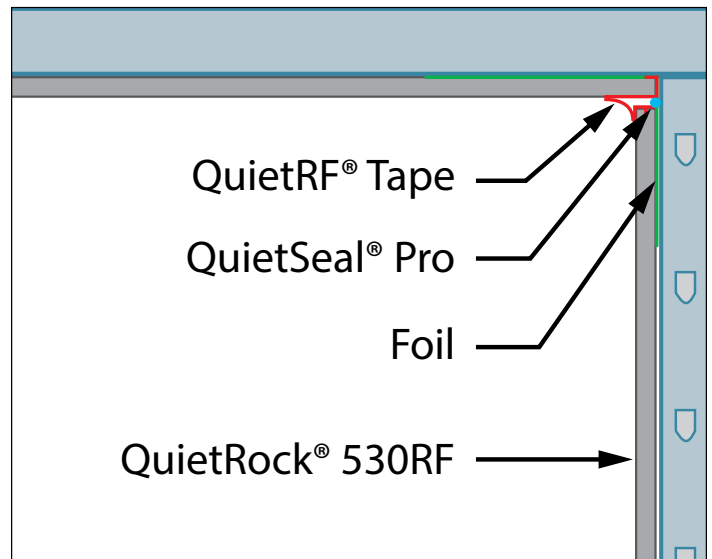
Inside Corner QuietRF® Shielding Tape application at ceiling
